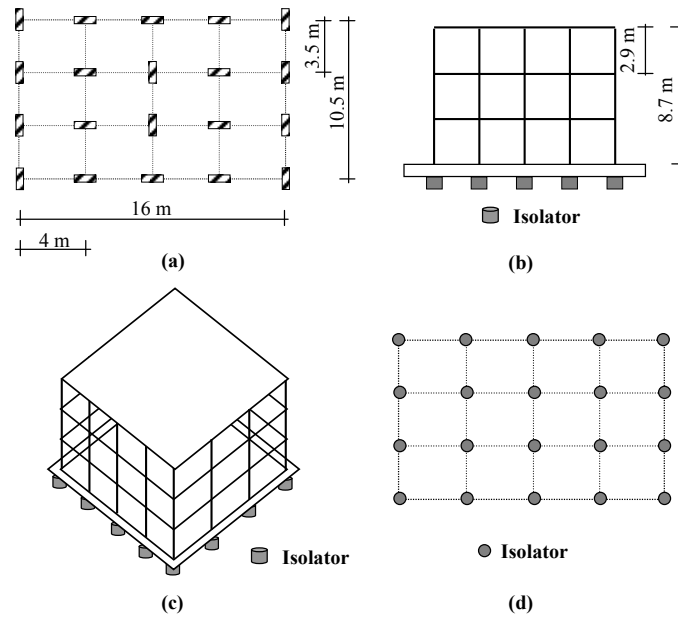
3-D model of 3-story isolated RC building: (a) plan, (b) elevation, (c) 3D layout, and (d) isolation system.
